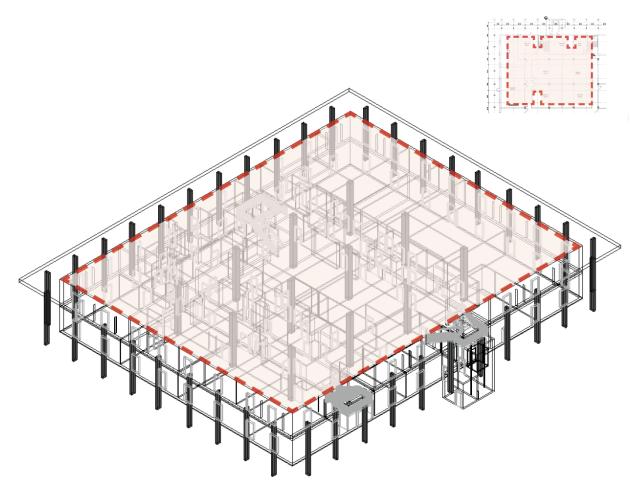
PERIMETER STRUCTURAL WALL MEMBERS OF THE MCSA TO REMAIN
